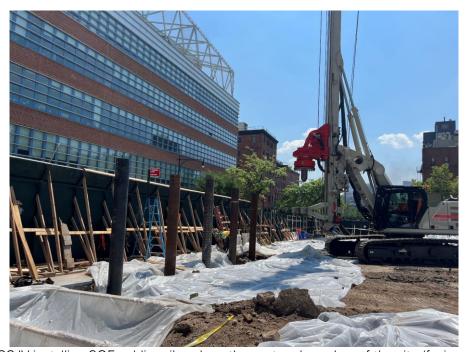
CCJV installing SOE soldier piles along the eastern boundary of the site (facing southeast)
